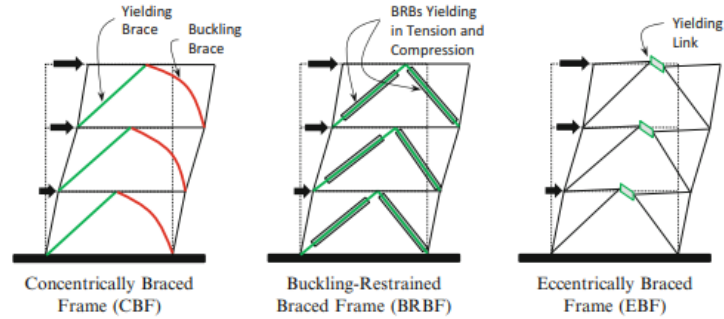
Types of steel braced frames (Marshall, 2021)
